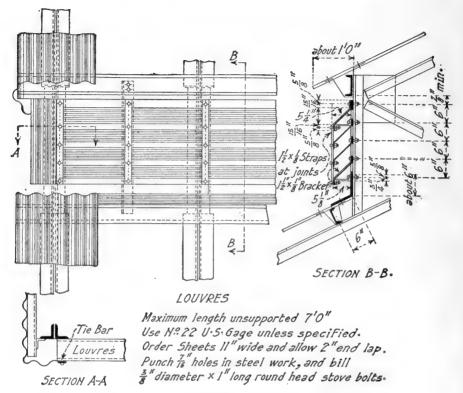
Details of a Steel Monitor Louvre Ventilator, American Bridge Company,
